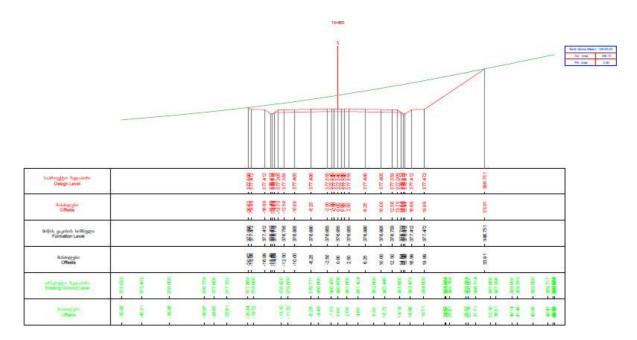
Typical cross section on the sites where the cuts are to be provided
